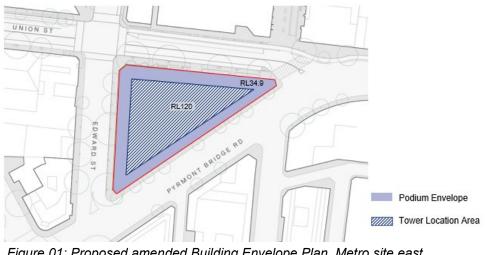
Proposed amended Building Envelope Plan, Metro site east
